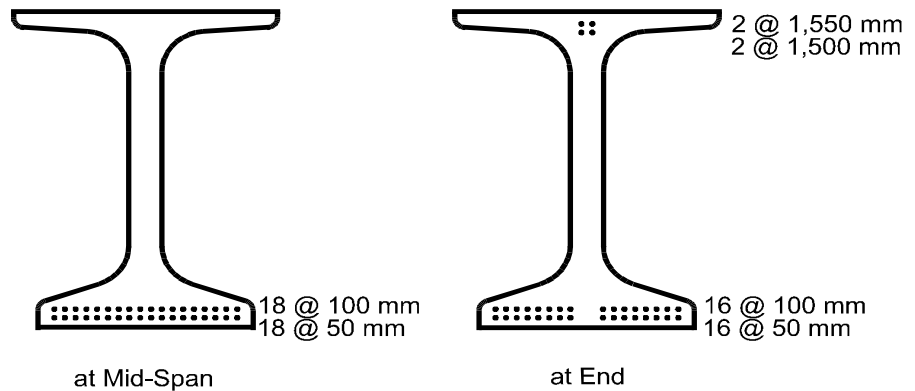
Strand Pattern (Span 2, Beam 2)
